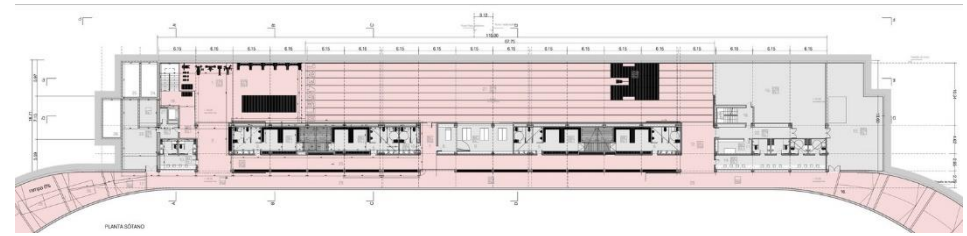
Calvia Running Track Basement level plan. (Niu Architects, 2013)
